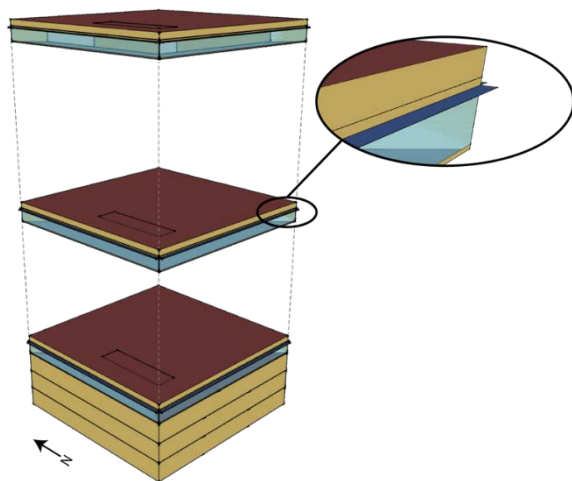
Singapore benchmark building with close-up on horizontal overhangs.
